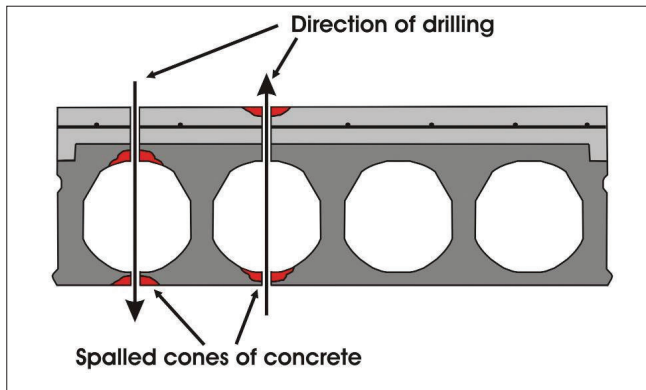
Illustration of the propensity for drilling through hollow-core units to cause spalling (Jensen 2006)
